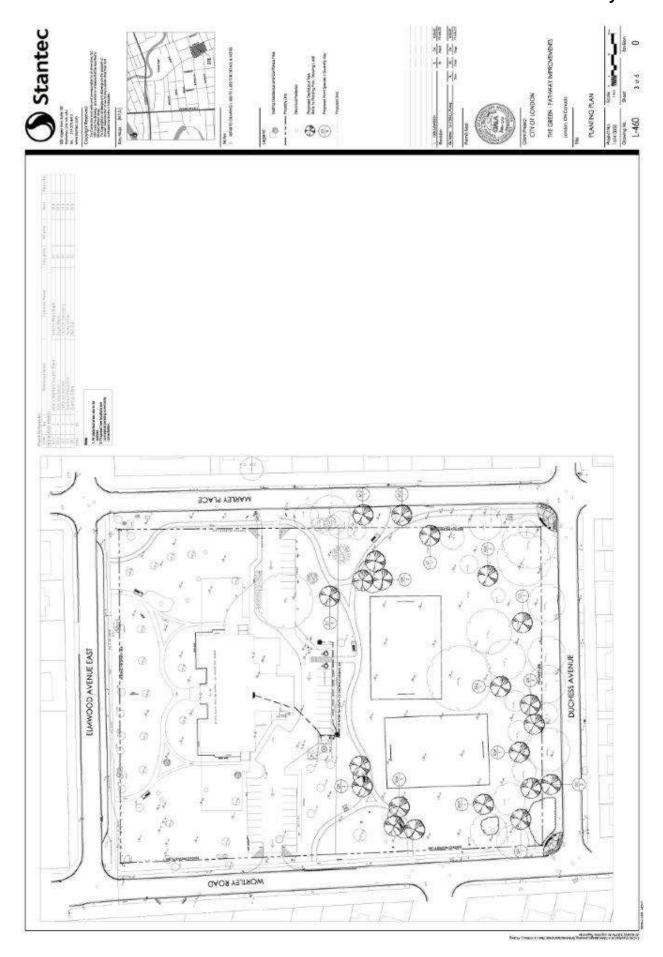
Drawing L-460: Planting Plan (April 2, 2018).
